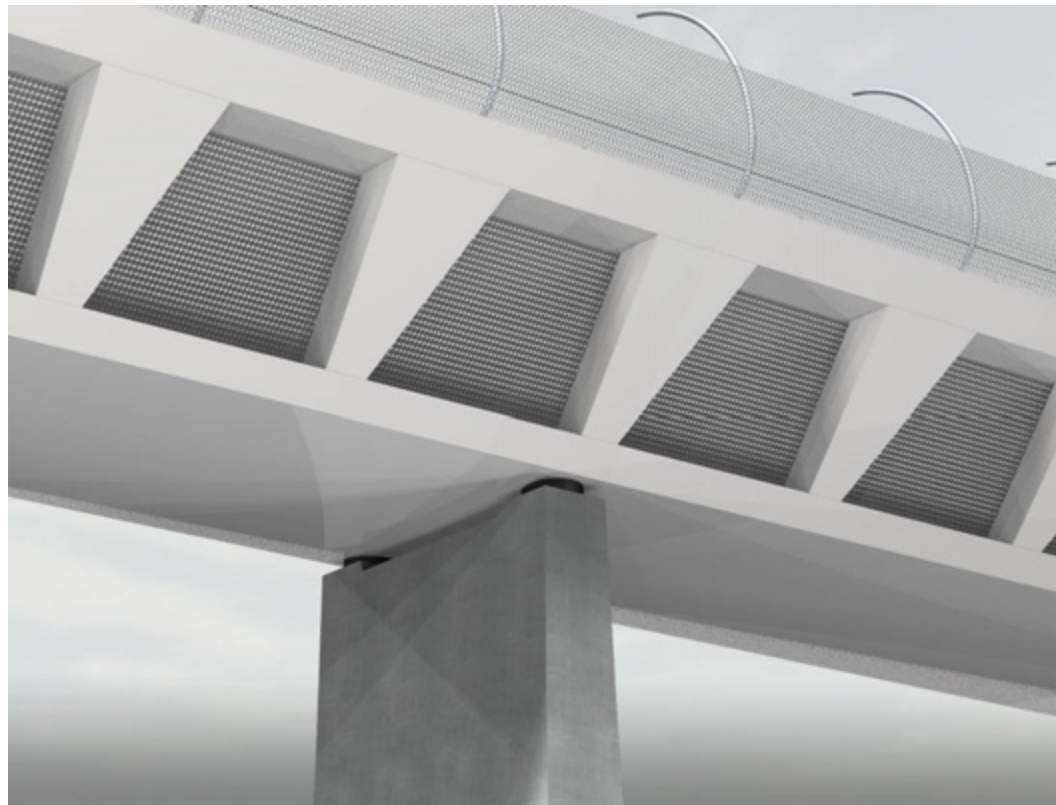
Double Level Approach Viaducts – Two Plane Vierendeel Truss
